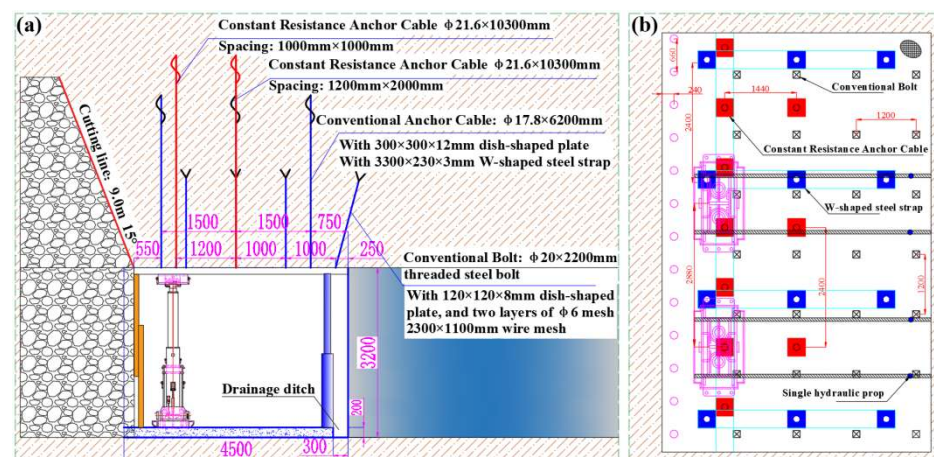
Temporary support for longwall mining: (a) cross-section; (b) plan view.
